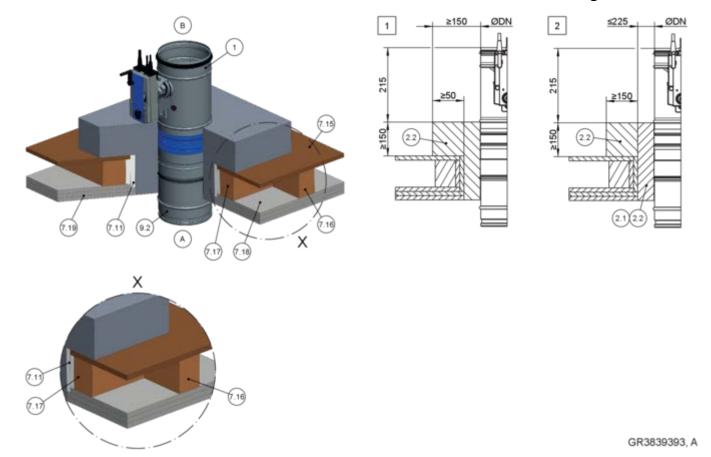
Mortar-based installation in solid ceiling slab in combination with wooden beam/gluelam ceiling
